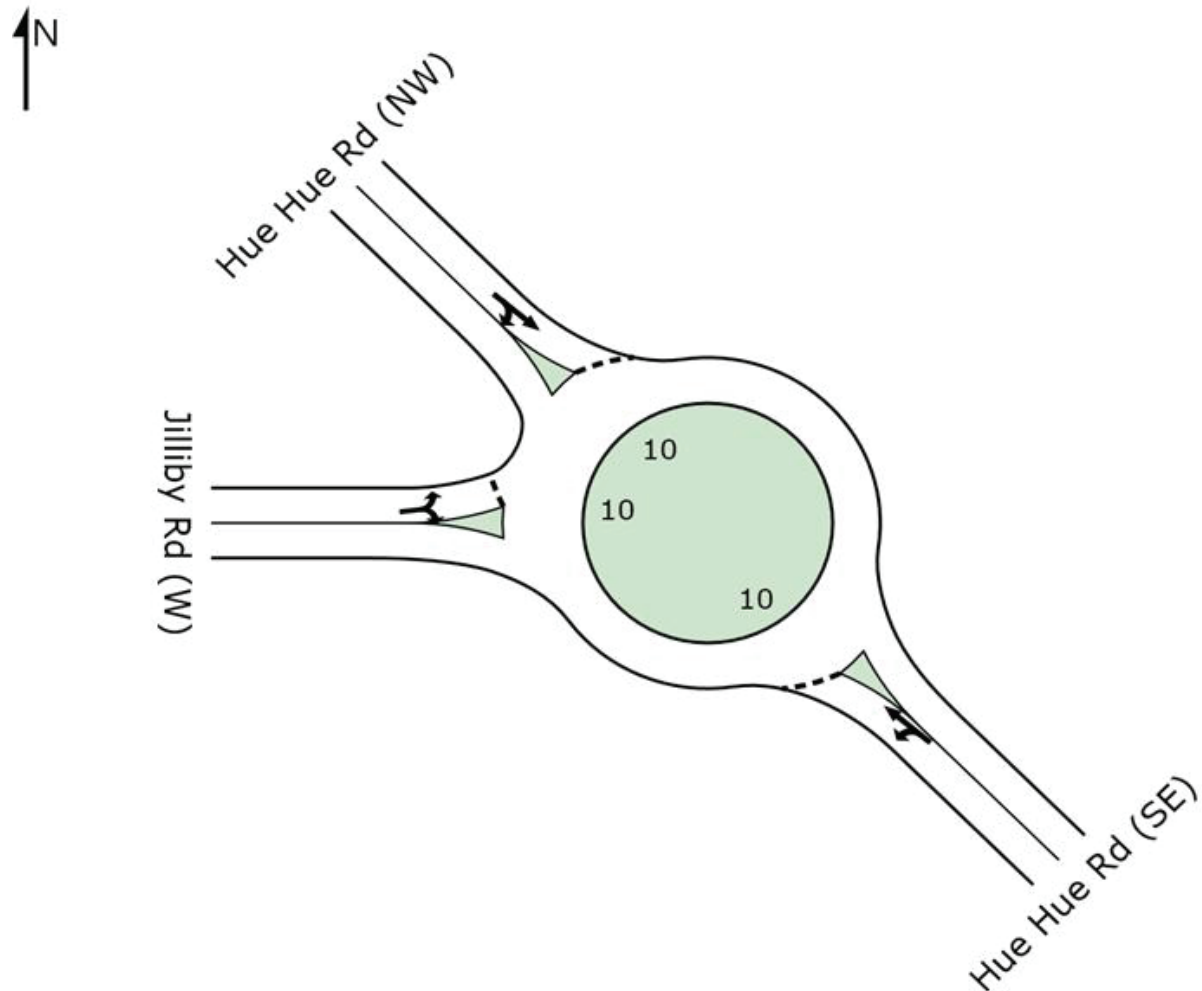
Proposed intersection layout for the Hue Hue Road/Jilliby Road intersection
